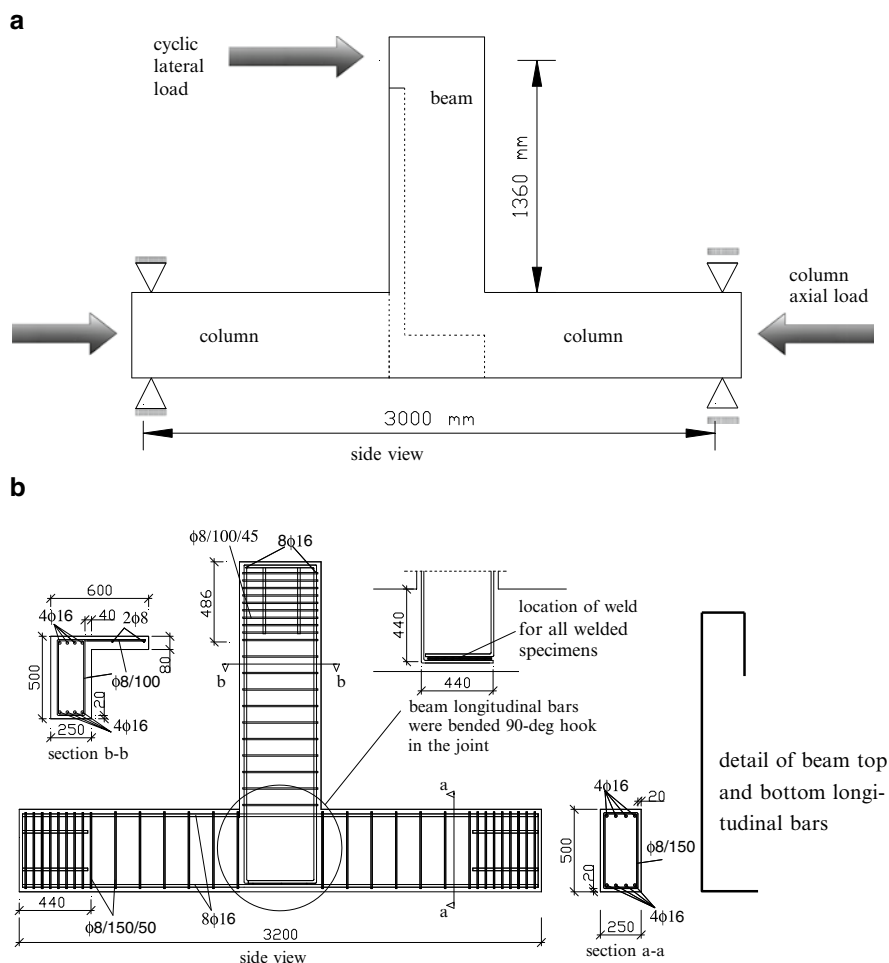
Geometry, test setup and reinforcement details (a) Specimen at the test setup (b) Reinforcement details (dimensions are in mm and clear cover is 20 mm for all members)
